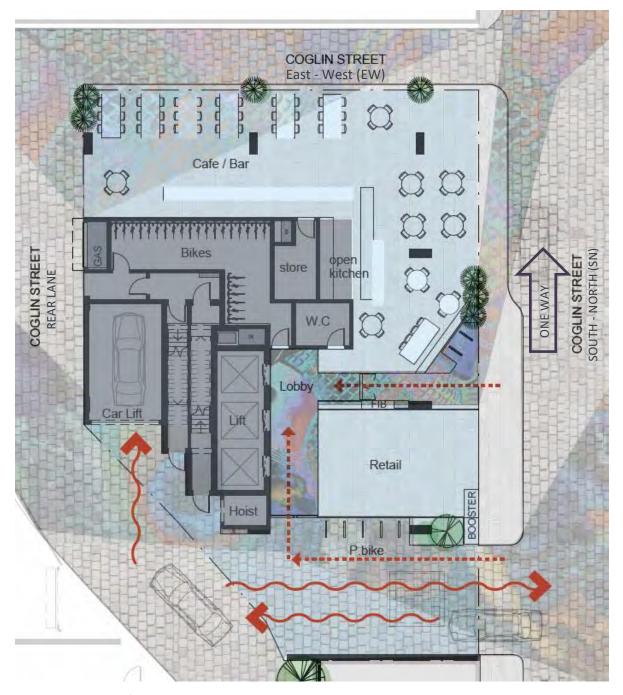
Ground floor layout and proposed Coglin Street access arrangement
